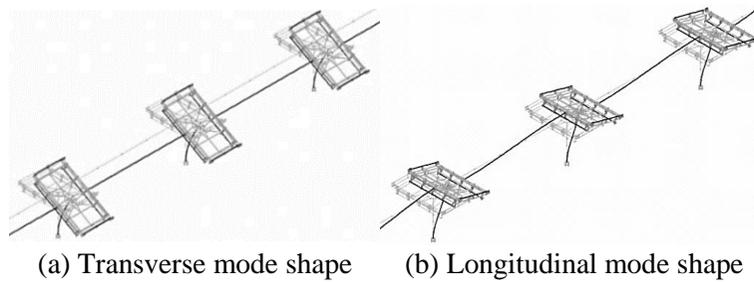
Fundamental mode of vibration of the studied bridges in transverse and longitudinal directions
